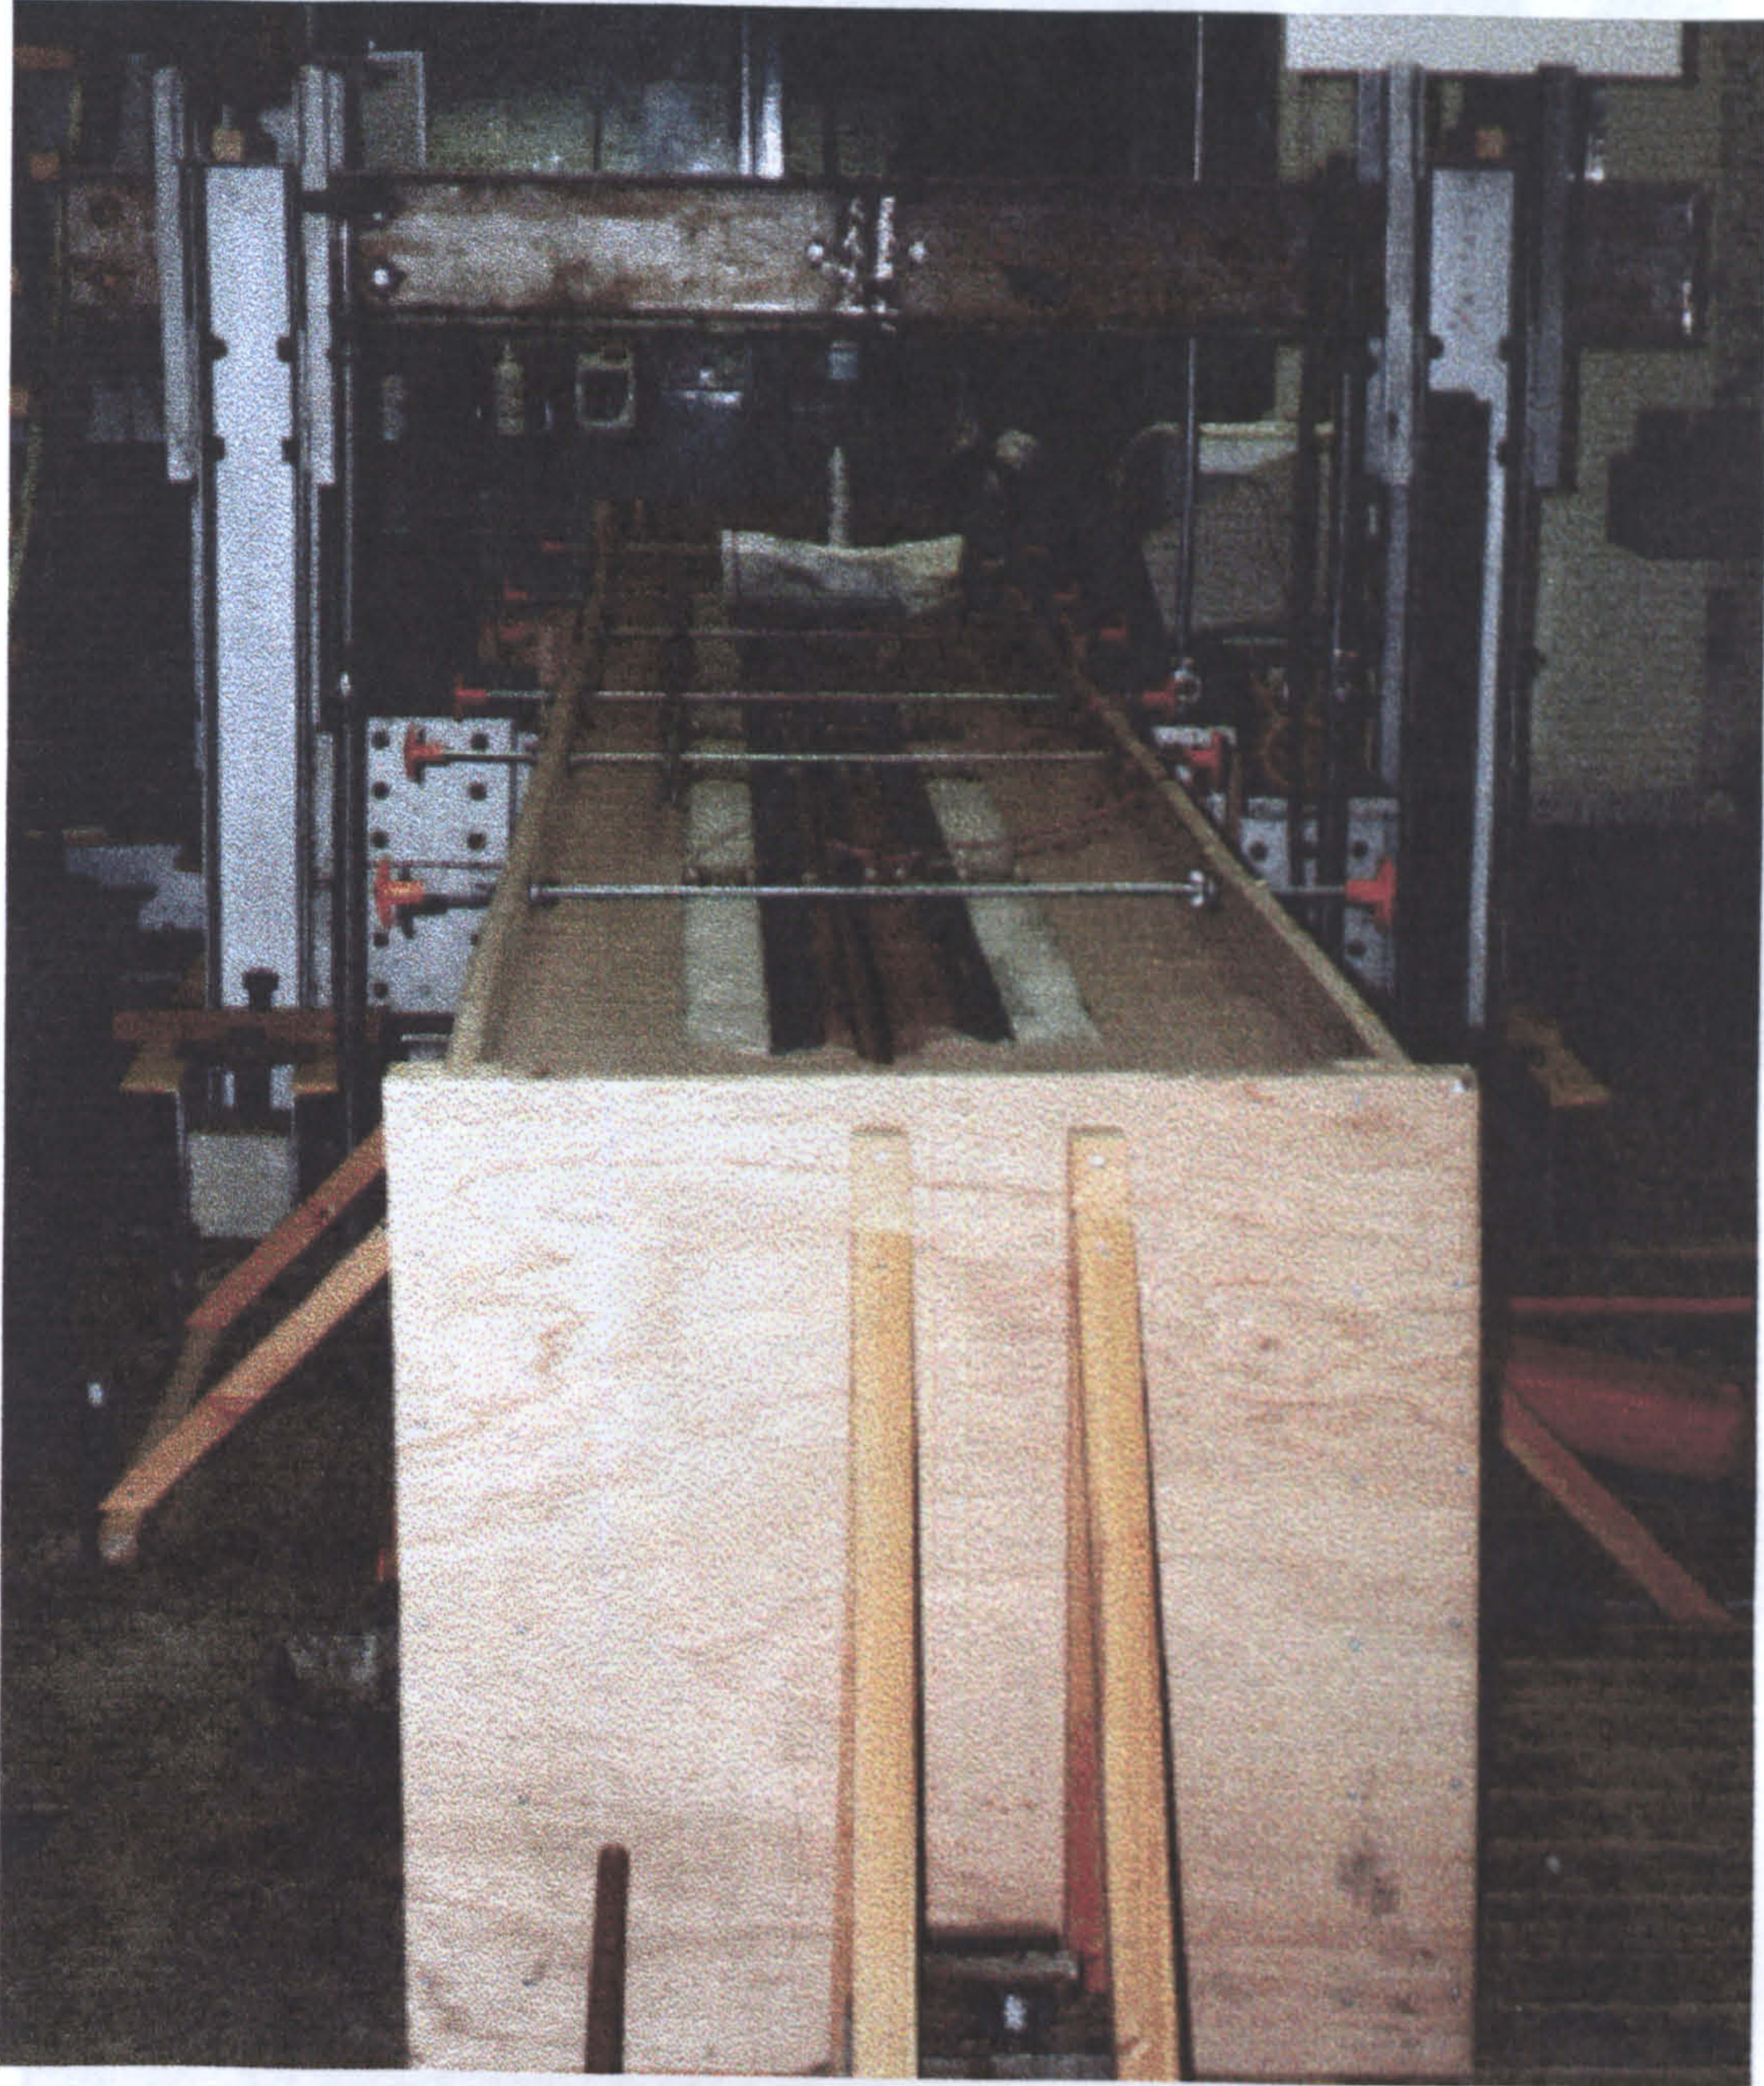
A test rig for the full-scale 6 m long LR55 track model.
